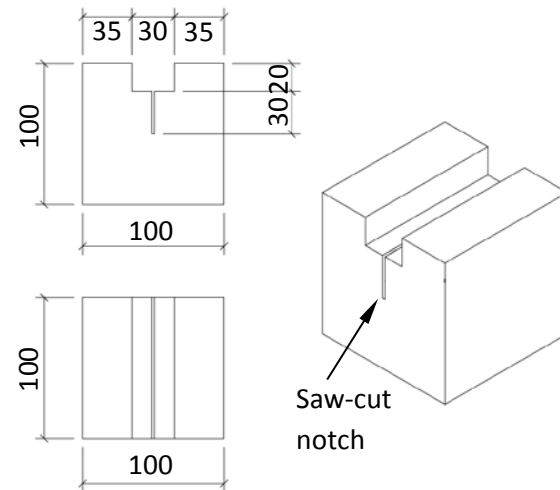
Wedge splitting test specimen dimensions (*de Villiers, 2015*)
